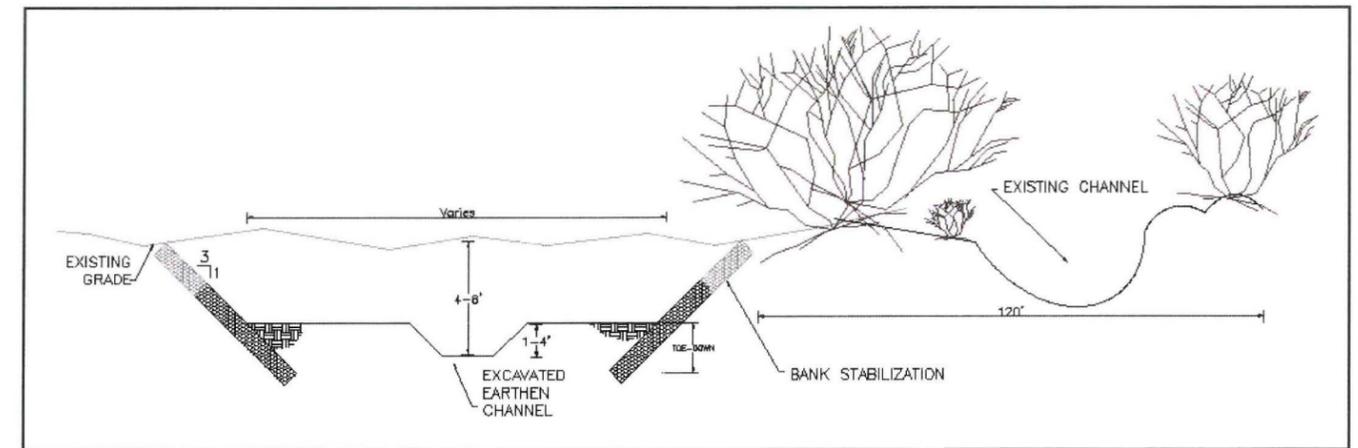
Concept Cross Section for Earthen Companion Channel (Alternative B3) (Not to scale)
